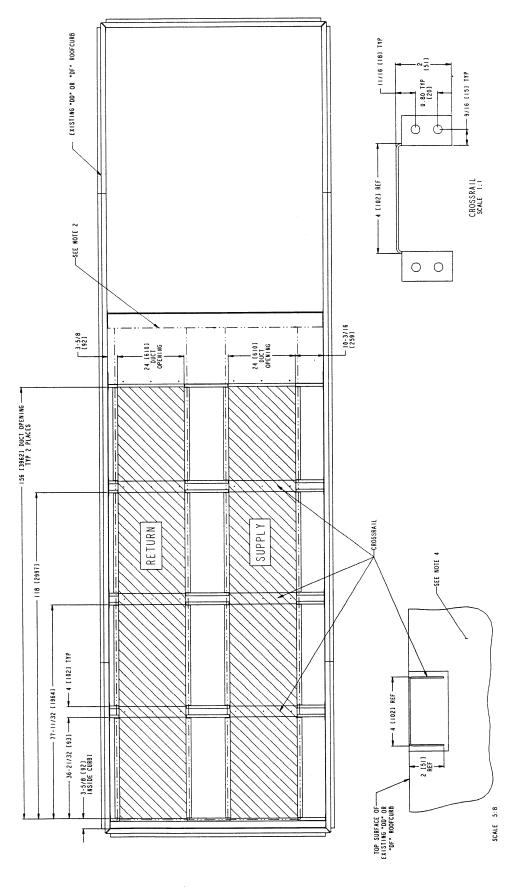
Roof Curb Adapter — (48AJ,AK060 and 48EJ,EK054-068 Units on 48DD,DF054-064 Retrofit, Part No. CRRCADPT005A00)
